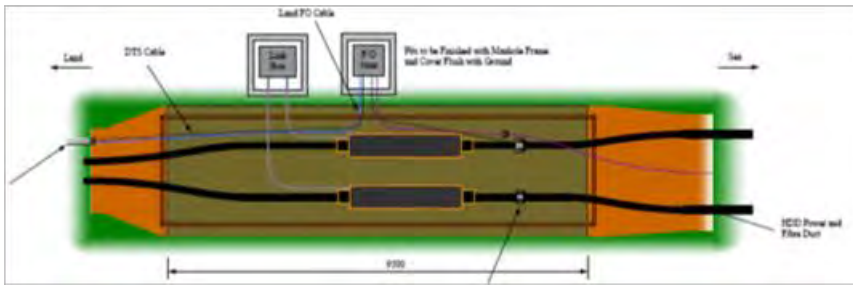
Typical transition joint bay lay-out for HVDC cable system comprising of 2 DC cables and a Fibre Optic (without MR cable)
